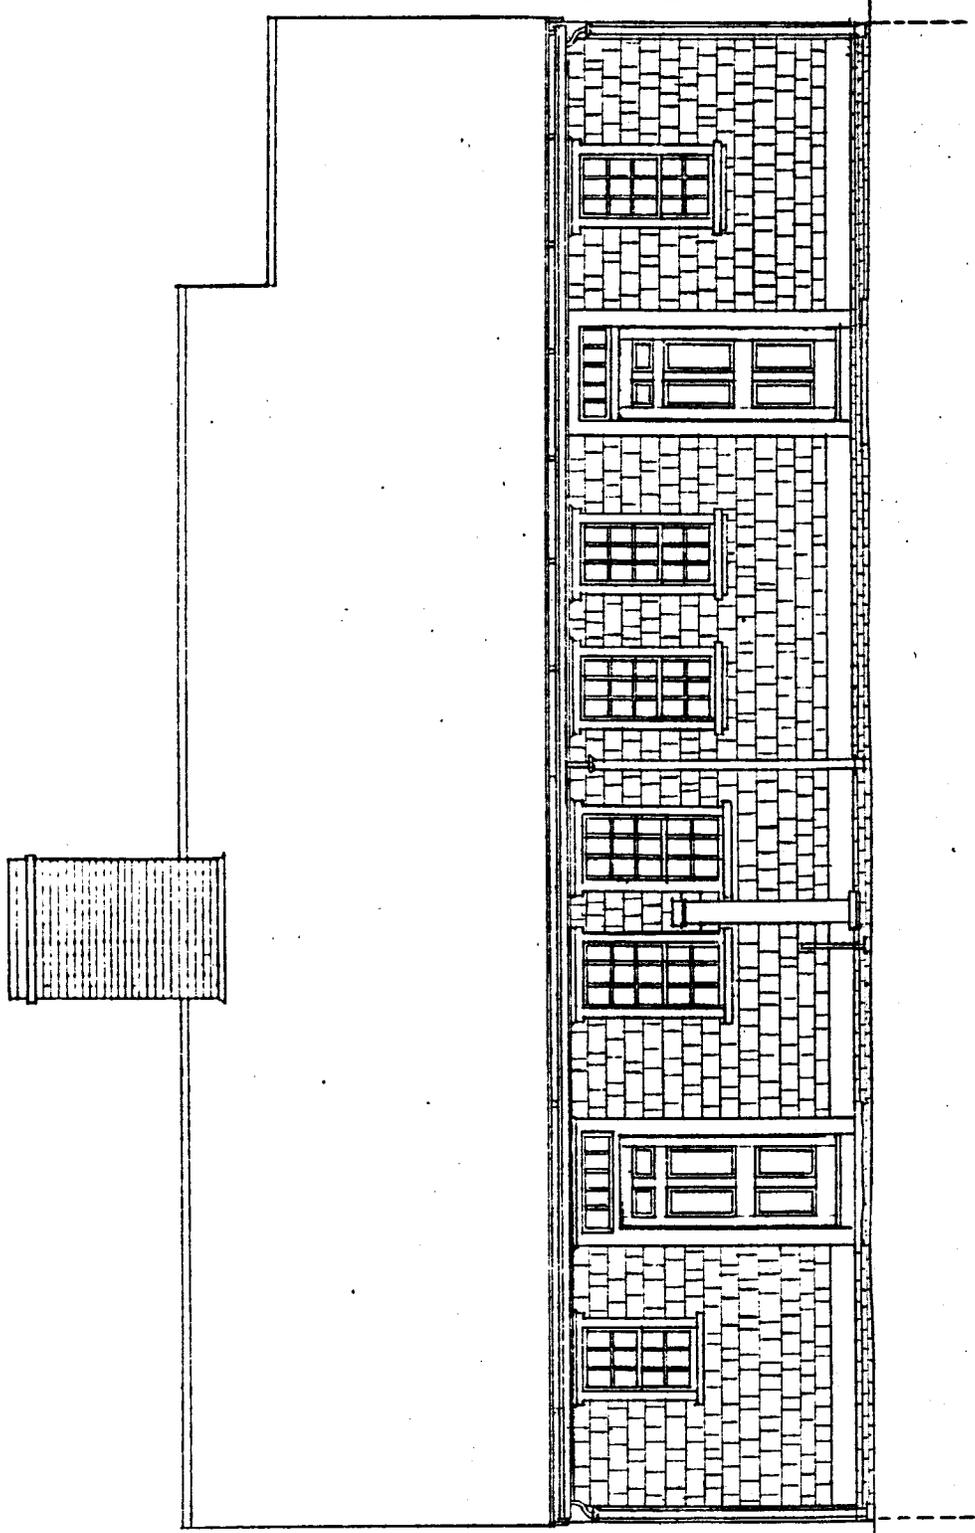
Atwood-Higgins House: North (Rear) Elevation.
